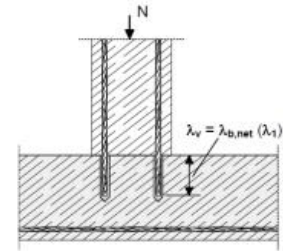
Rebar connection for components stressed primarily in compression. The rebars are stressed in compression
